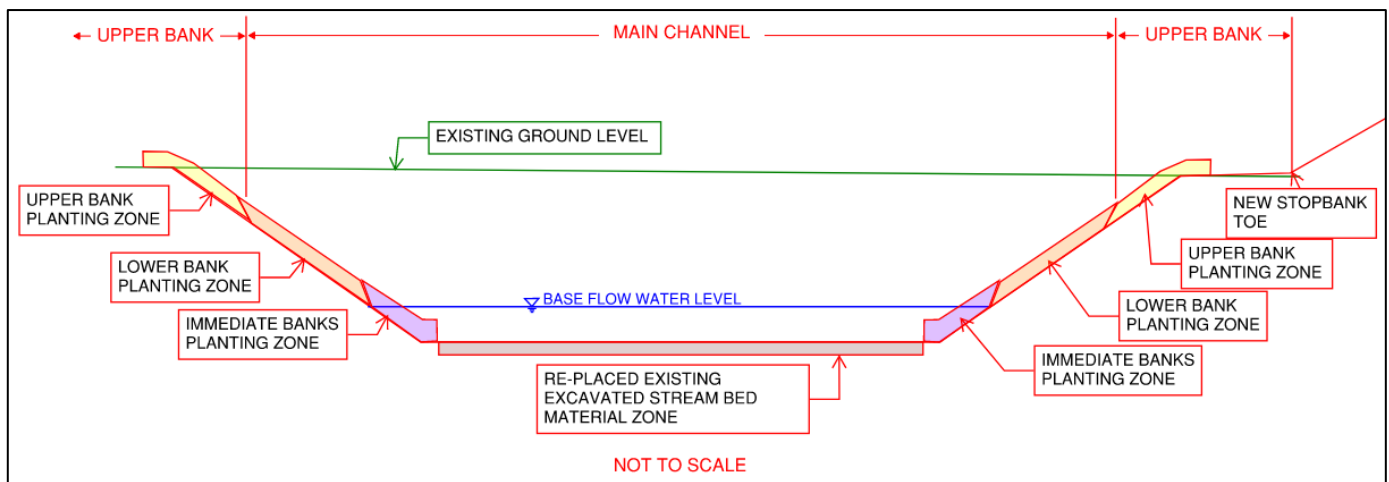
Proposed typical stream diversion channel and planting plan.
